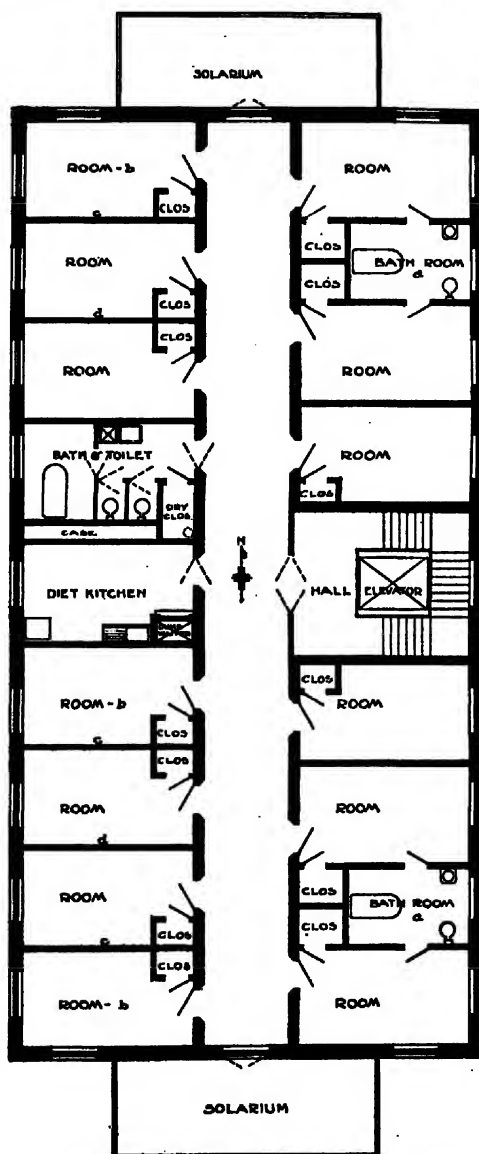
TYPICAL FLOOR FOR A MANY-STORIED HOSPITAL.
